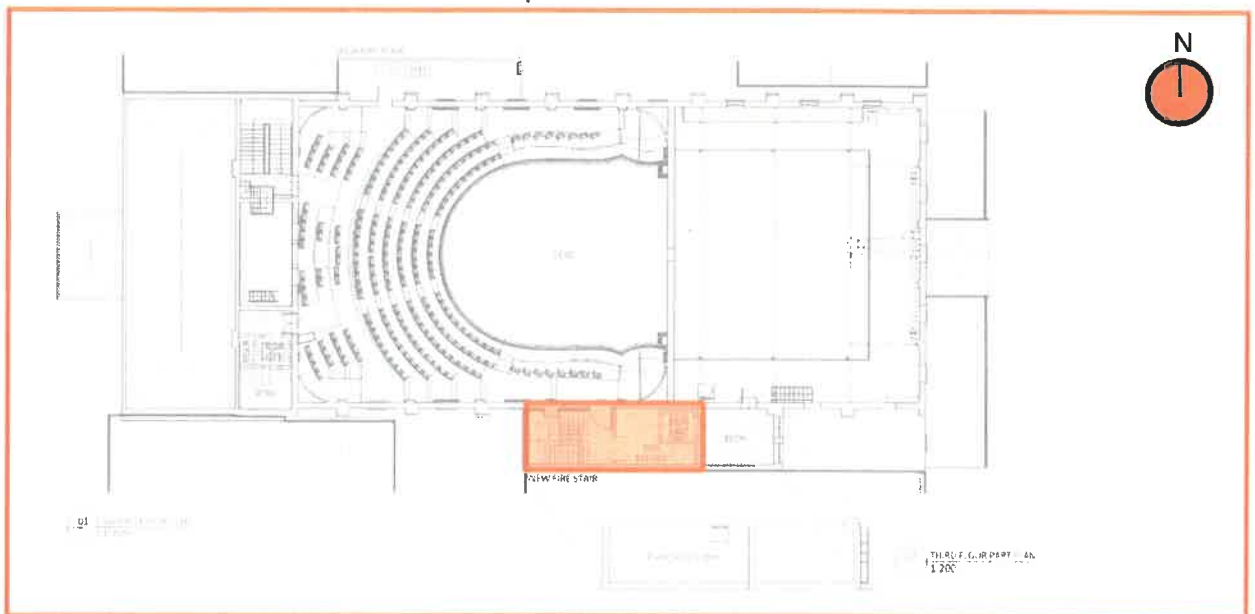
Lift and Stair in the Same Shaft – Second Floor
